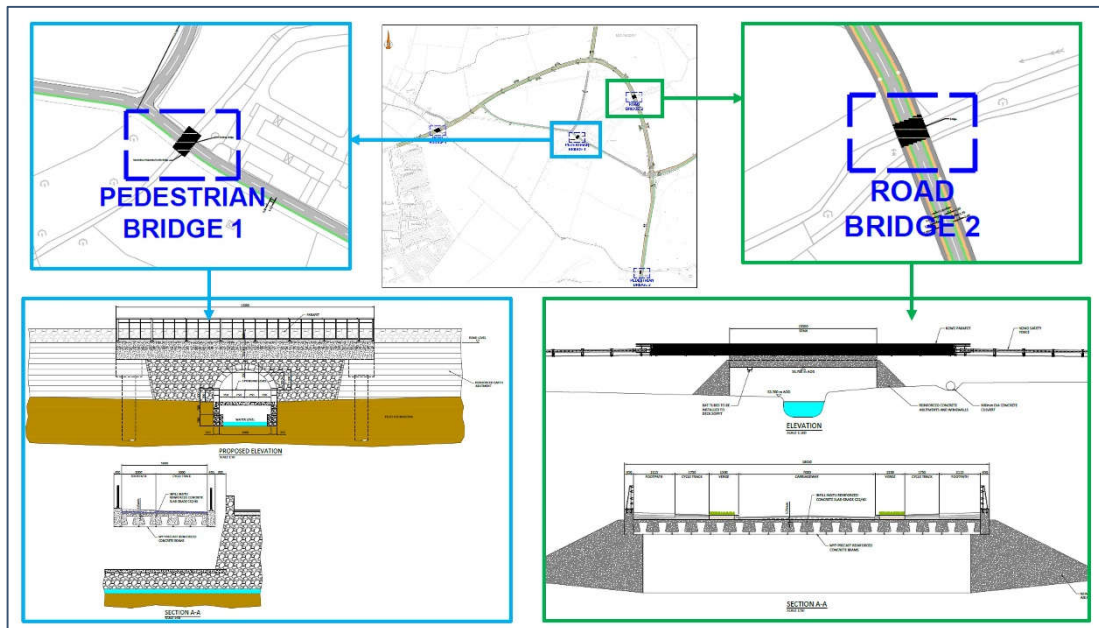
Proposed Bridges along the route of the MOOR – Imagery extracted from Planning Drawings (OCSC, 2022)
